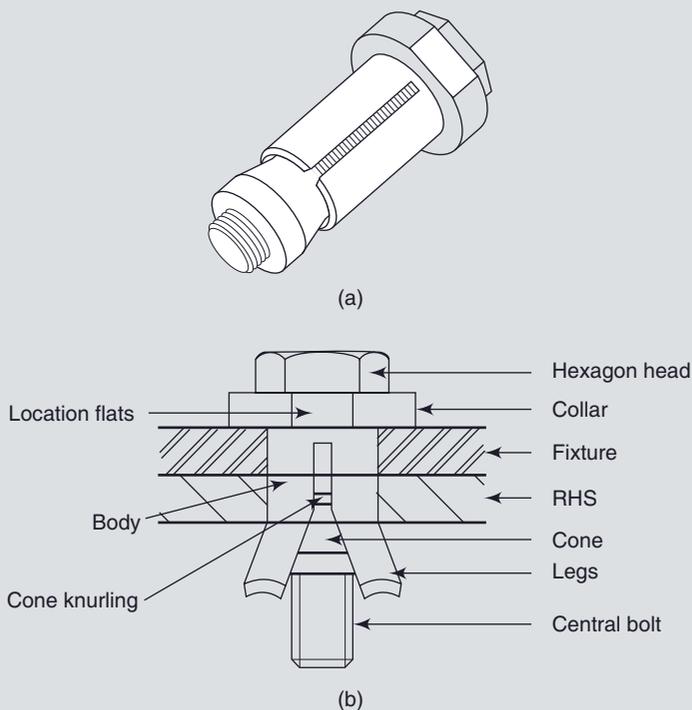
(a) Hollo-bolt and (b) hollo-bolt assembly
